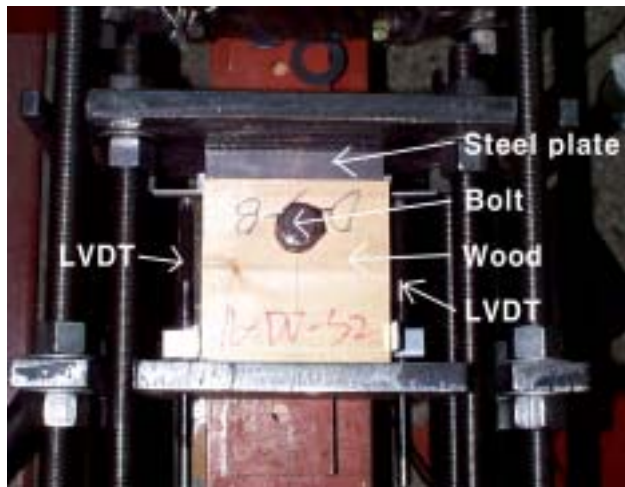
Picture of testing arrangement for double shear of bolted joints.
